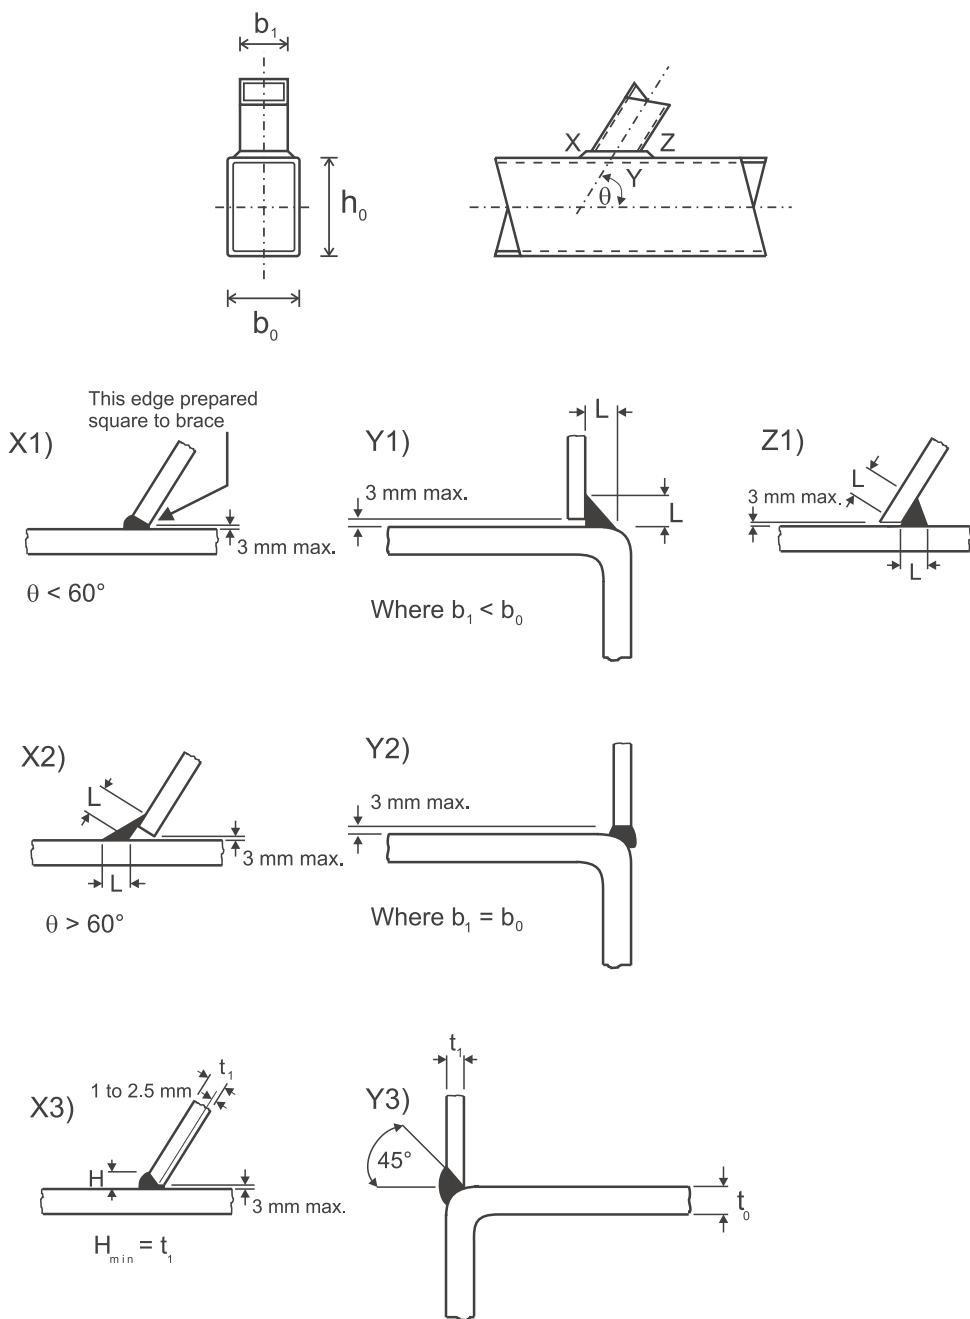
Fillet and butt (groove) welds in lattice joints between rectangular hollow sections
